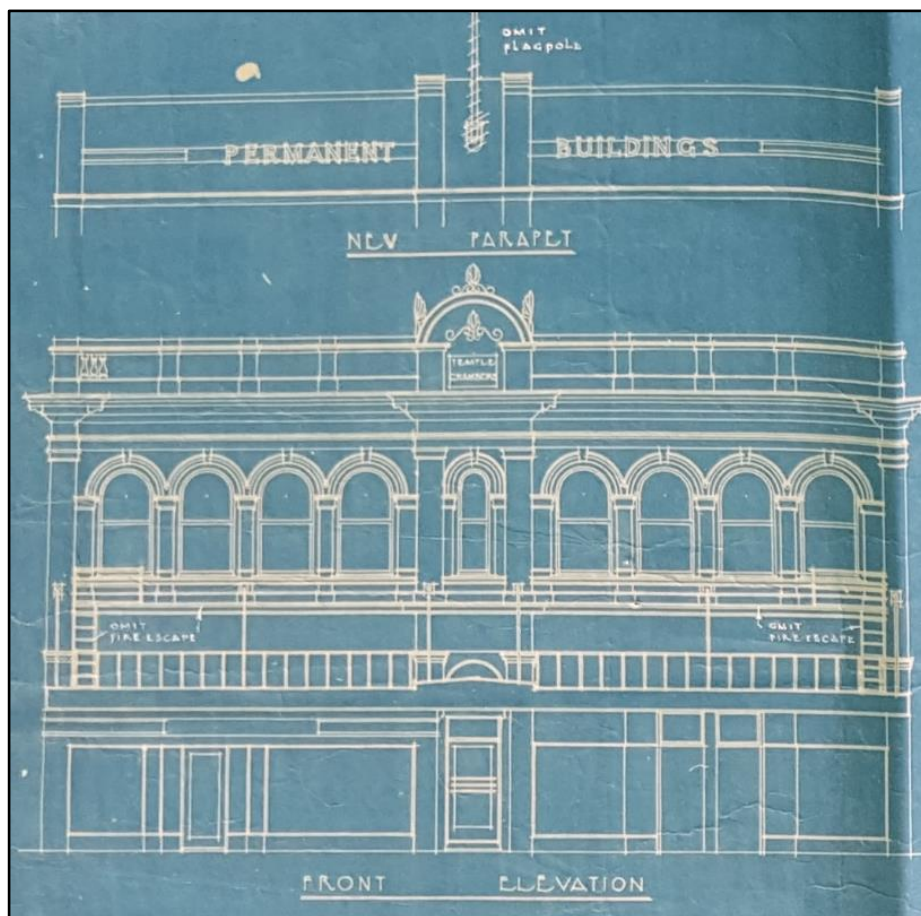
Detail from 1944 plan of alterations to the street façade of the Temple Chambers at 45-49 Esk Street (Ford, 1944).
